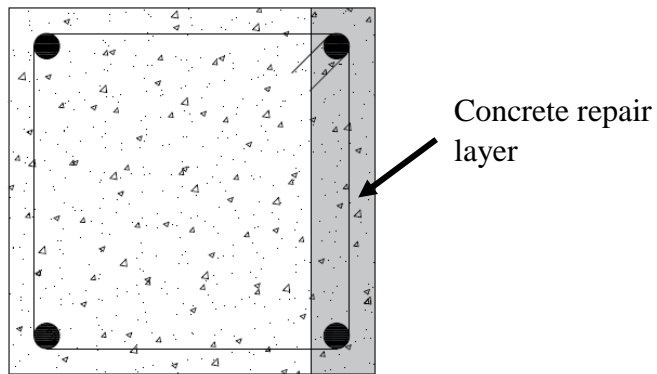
Cross-section of large repair layer encompassing reinforcement to damaged column
